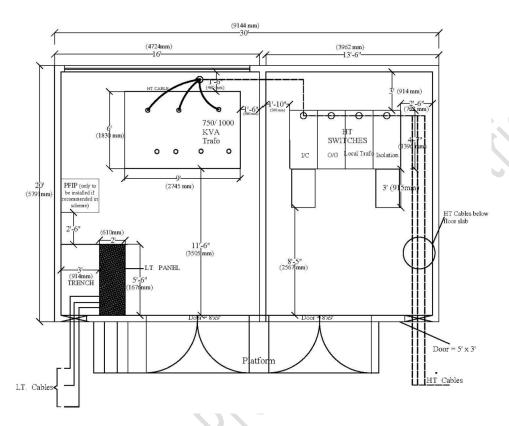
11kV Sub-Station Room (11kV Switchgear Room)
